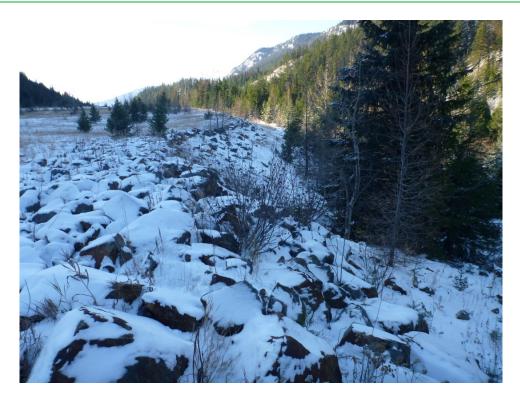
Good Friday crest of West Limb of dam. Photo taken at right abutment facing south.
